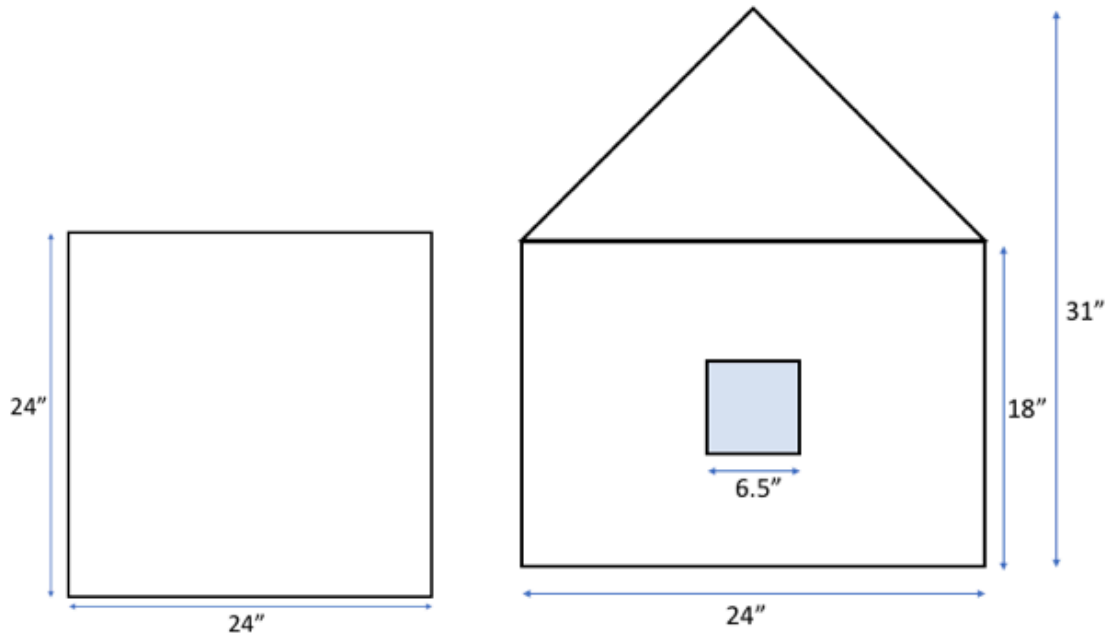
shows the floor plan of the mock up (left) and the elevation plan of the front of the mock building (right)
